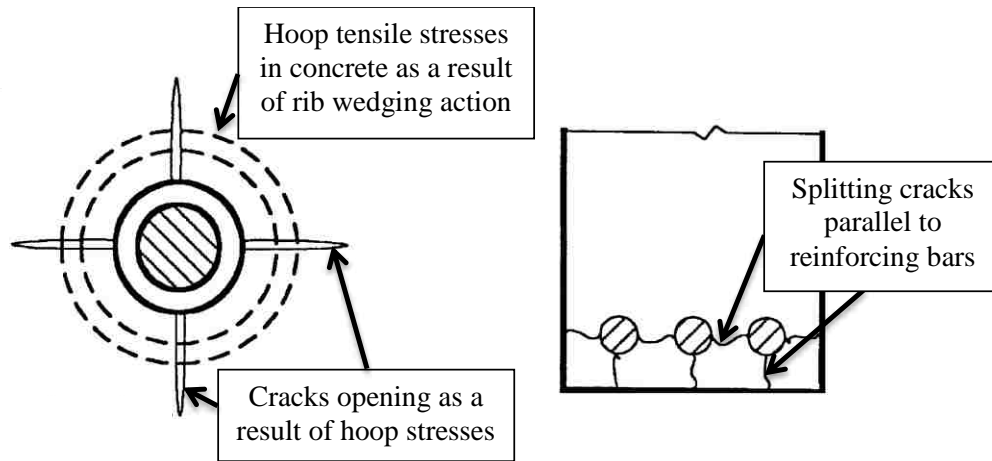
Tensile stress field/cracks in concrete surrounding a reinforcing bar (left) and splitting cracks in end view of concrete member (right) (ACI 408R-03)
